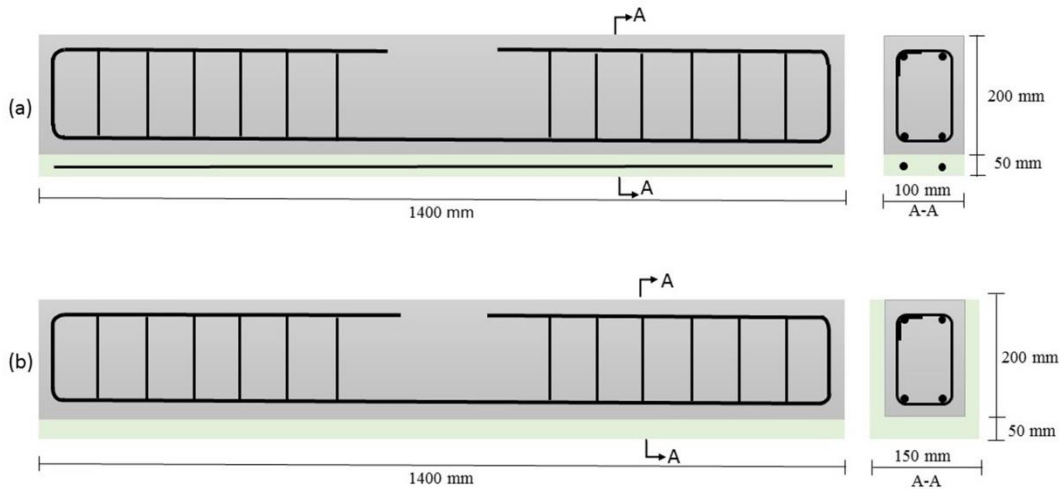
Geometry and reinforcement details of the initial beams (dimensions in mm).
